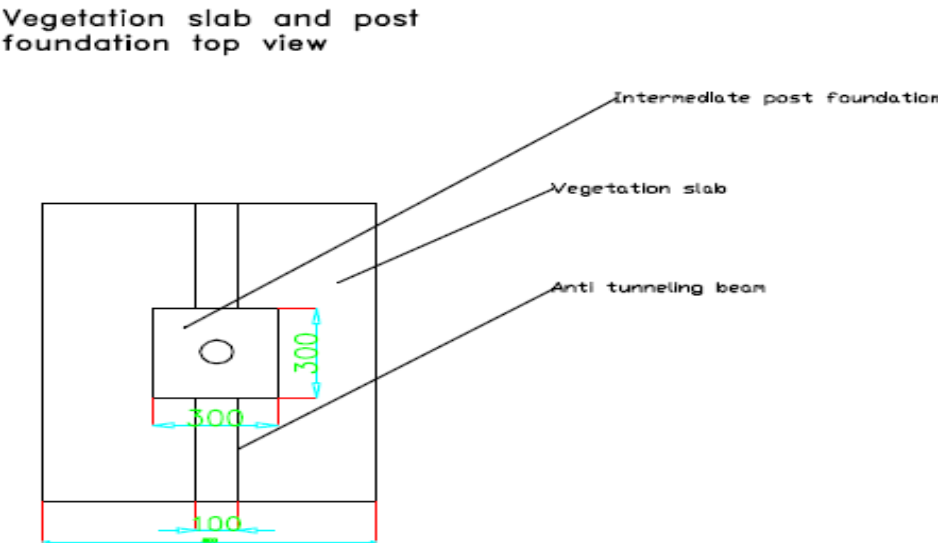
Vegetation Slab and Anti-tunnelling Beam Plan Layout
